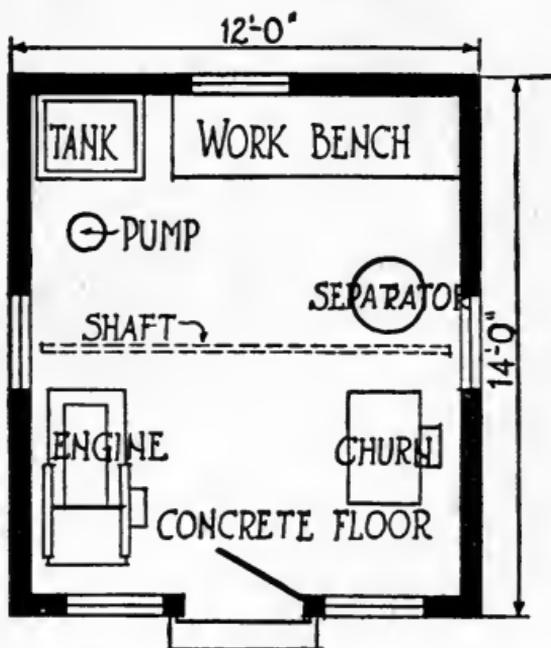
Floor Plan of Separate Farm Dairy House, Showing How the Engine, Pump, Churn and Separator are Placed
